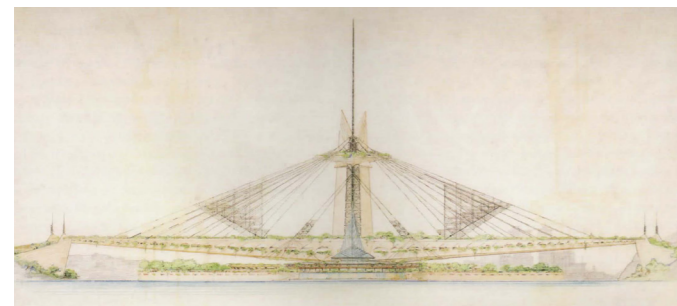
Point Park Project. Second Scheme. West elevation, 1947.
